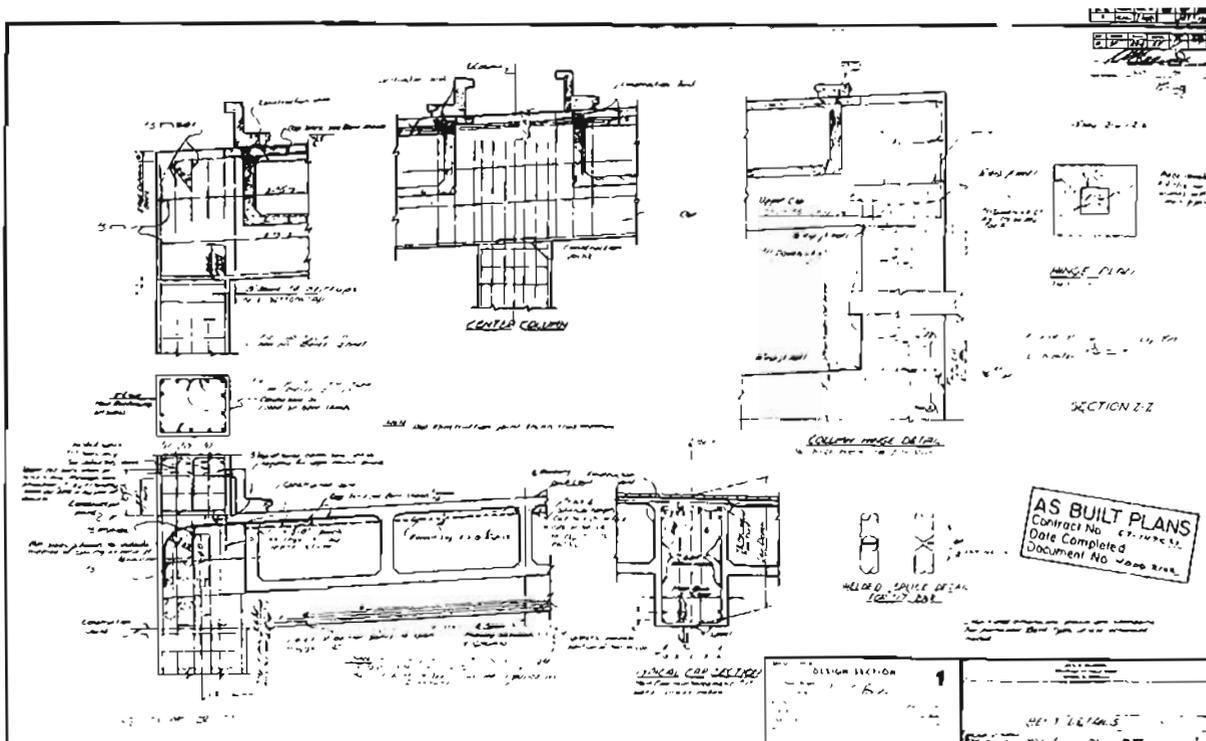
Embarcadero Viaduct, transverse bent details.
